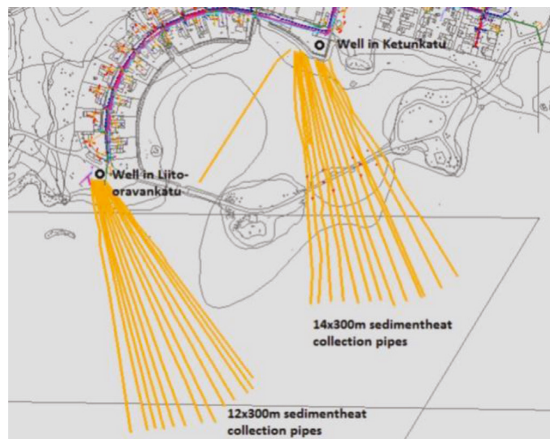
The heat collection pipes were installed a fan like structure where pipes are connected to energy collection well. Current installation has two wells with 12 and 14 collection pipes. Source of Figure: Vaasan Eko-lämpö Oy.
